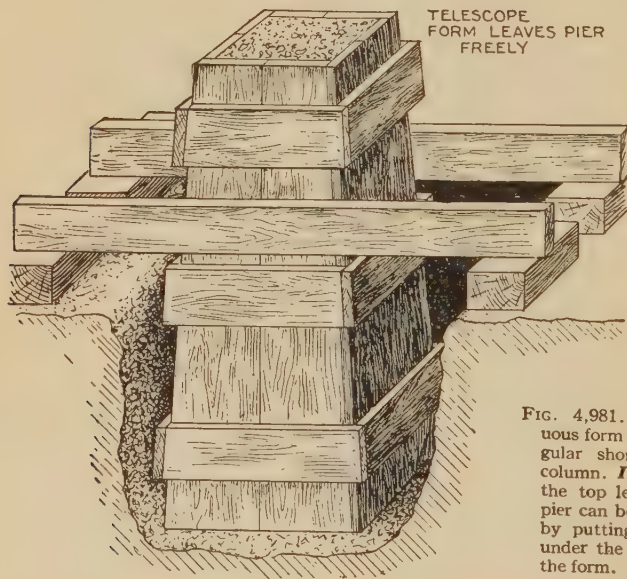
,981. — Continuous form for rectangular short pier or column. *In placing*, the top level of the pier can be regulated by putting blocks under the handles of the form.
